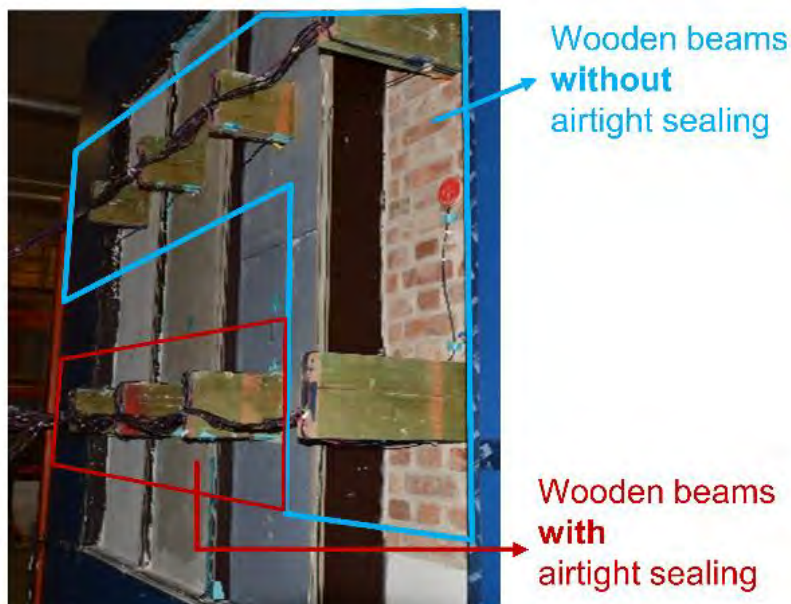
Each test walls contains two wooden beam-ends, some airtight sealed, some without airtight sealing.
